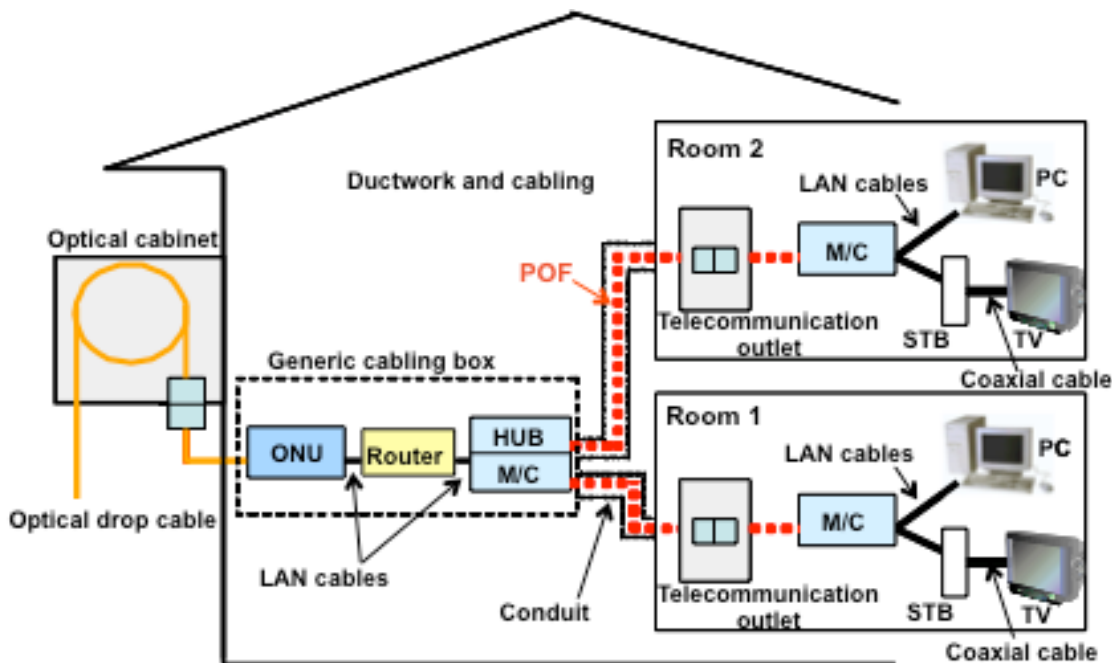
An example of cabling configuration of acrylic resin-type POF for newly constructed houses
